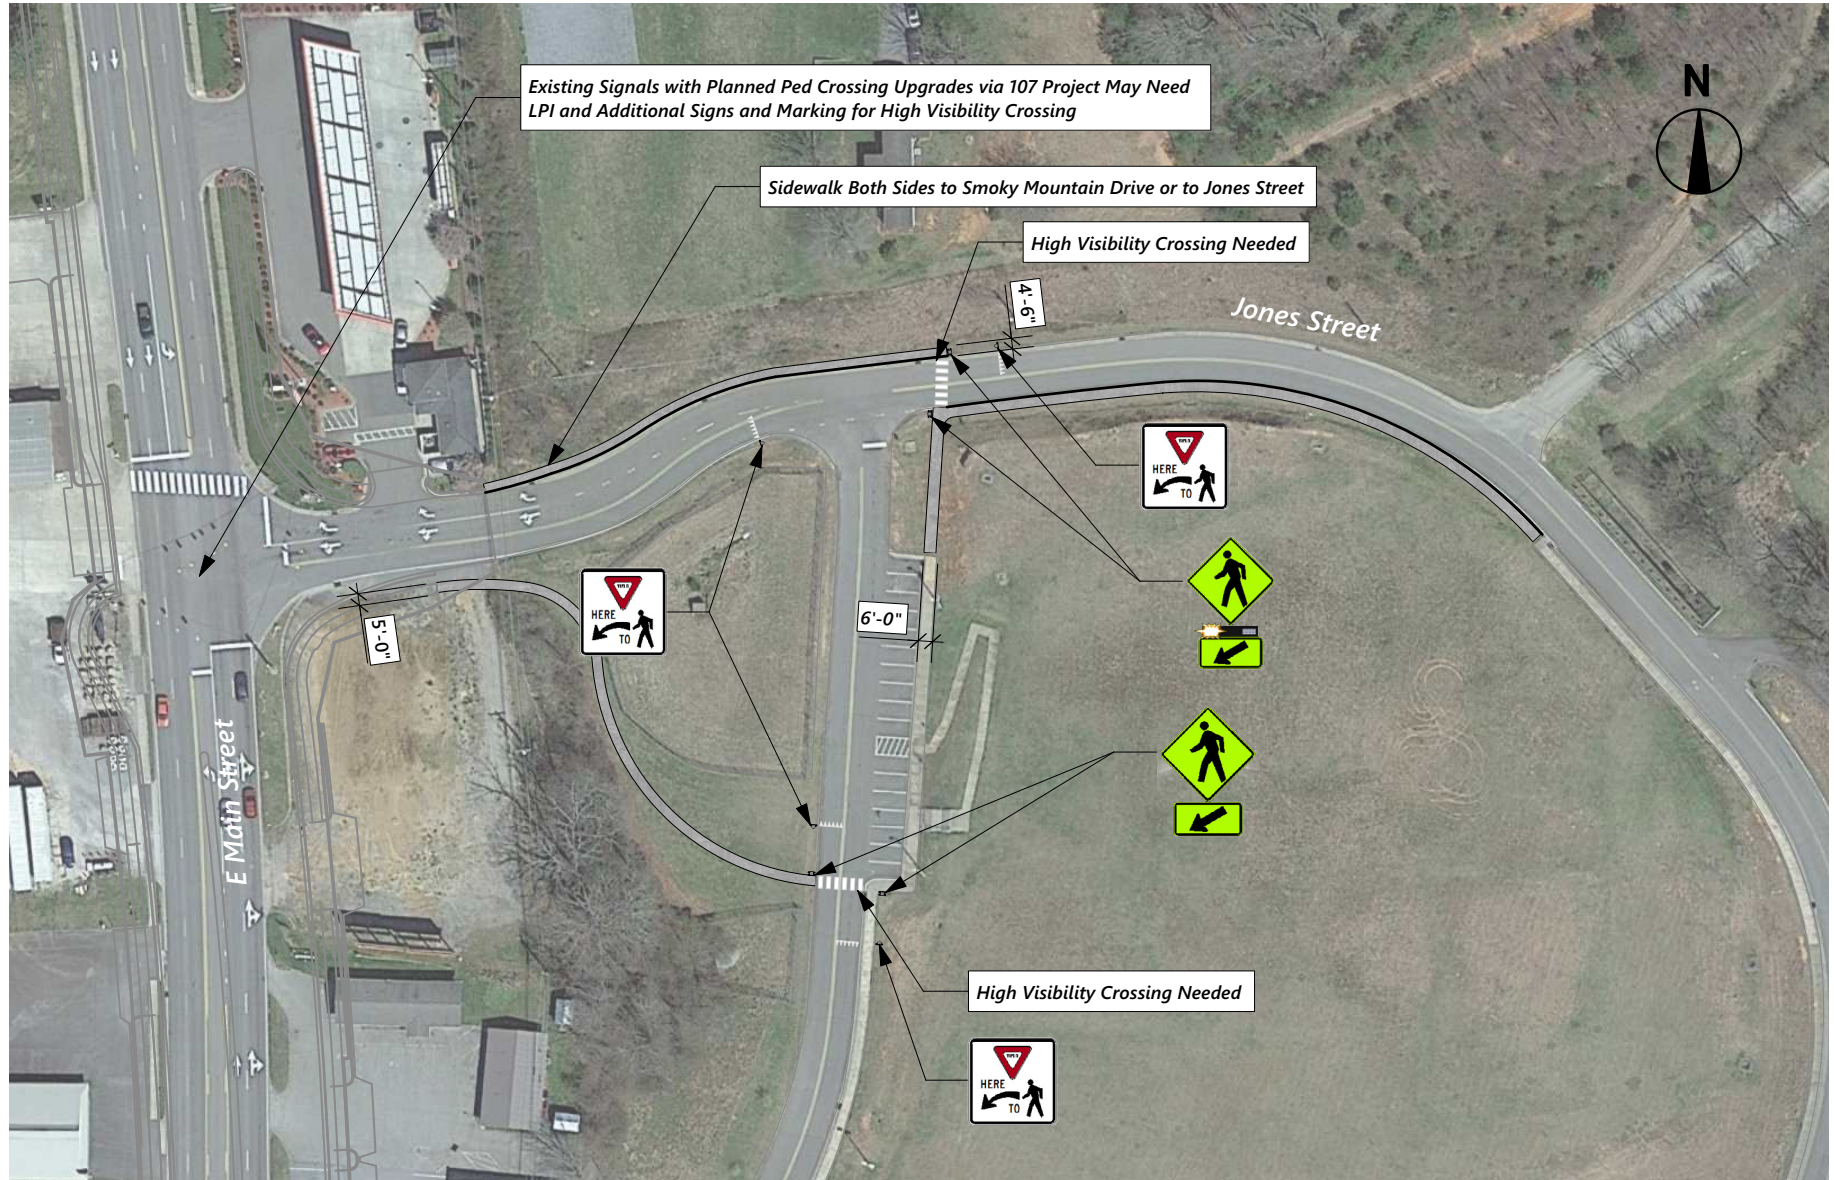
Pedestrian Connection Concept Plan (Cliffside Drive)
